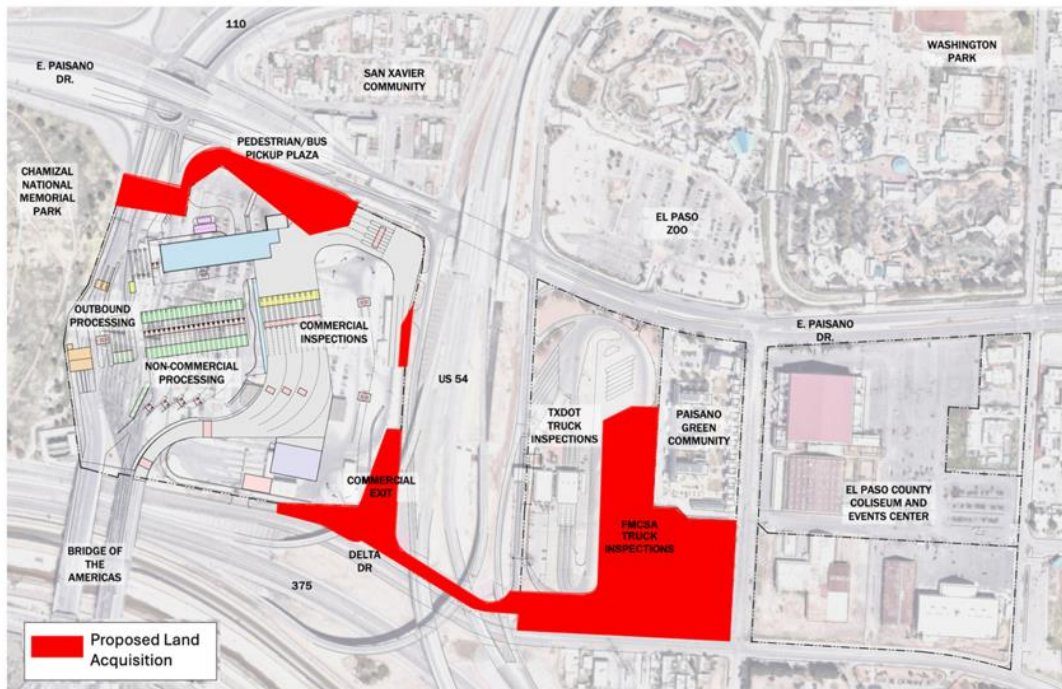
Viable Action Alternative 1a Site Design/Layout and Land Acquisition.
